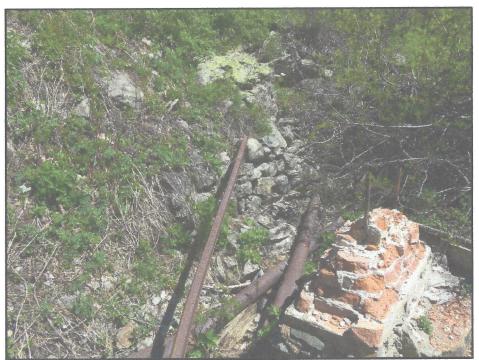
Northernmost stone retaining wall remnant behind probable electric motor mount. View is to the north.
